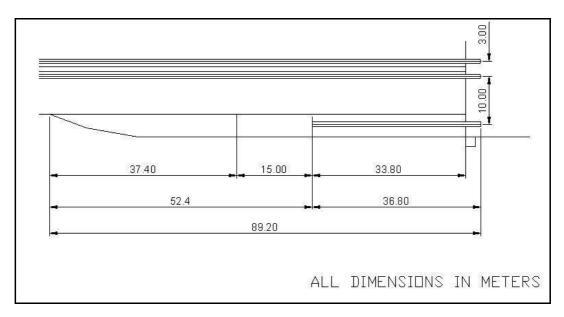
Top View Crossing Junction Access Rail Dimensions
